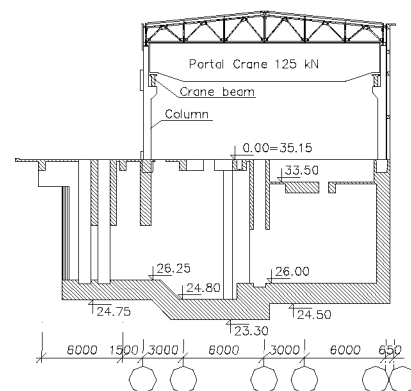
Replacement of Heavy Roof with Light Steel Structure
